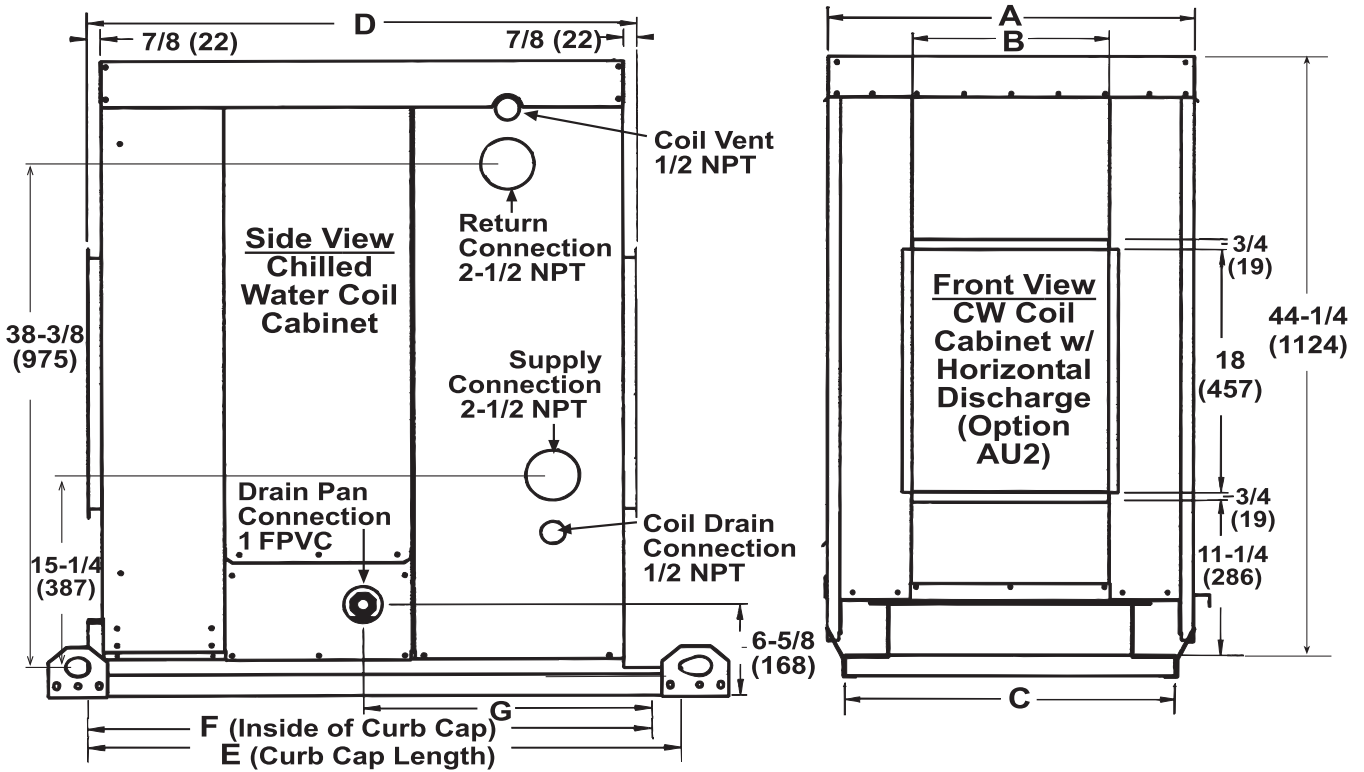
Cooling Coil Cabinet Dimensions (Refer to [Table 2](#))
